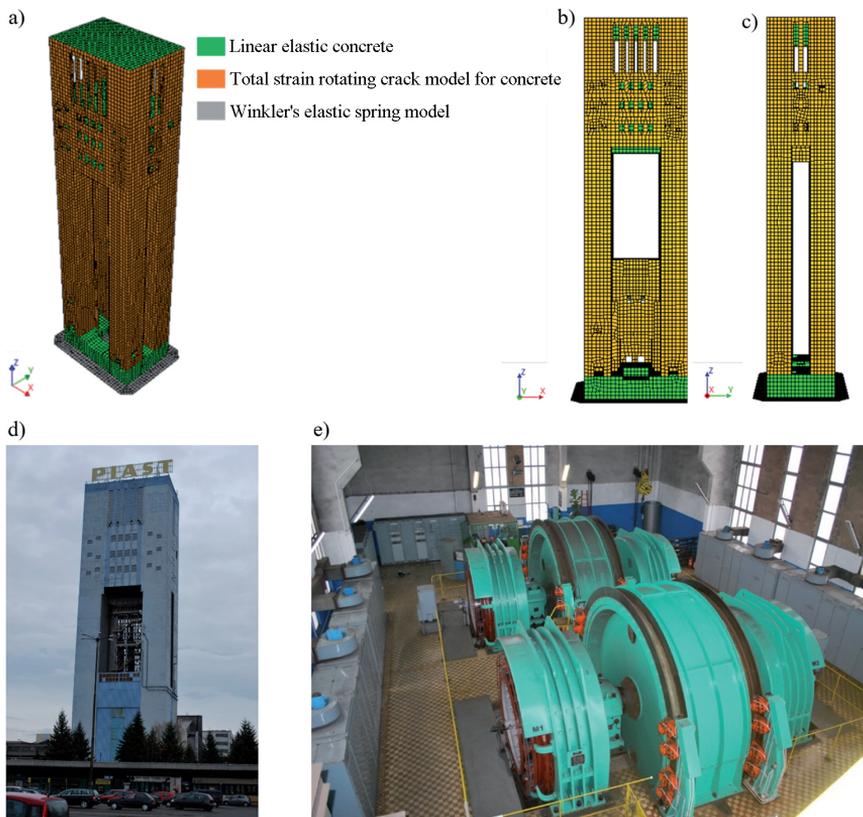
Hoist tower and finite element model of the structure, a) 3D model of the tower, b) main load-bearing walls in the x - z plane, c) main load-bearing walls in the y - z plane, d) structure of the hoist tower, e) heavy weight machinery (level +80 m above the ground)
